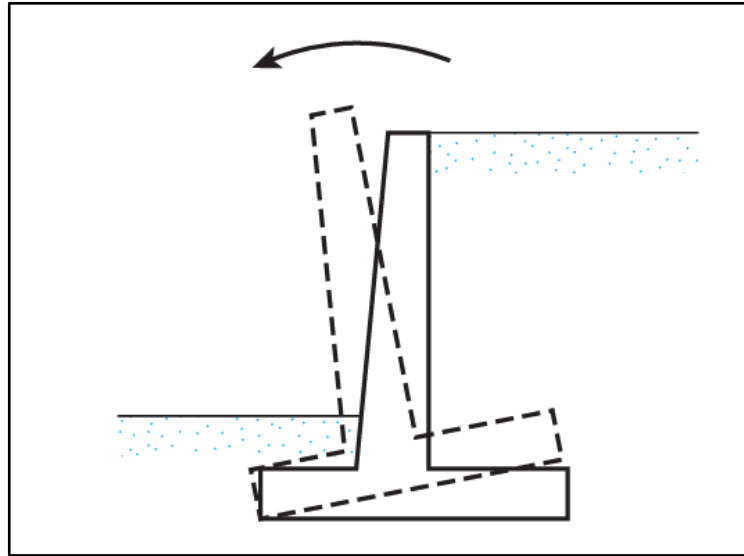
Overturning Stability Failure of Retaining Wall (Das, 2011)
